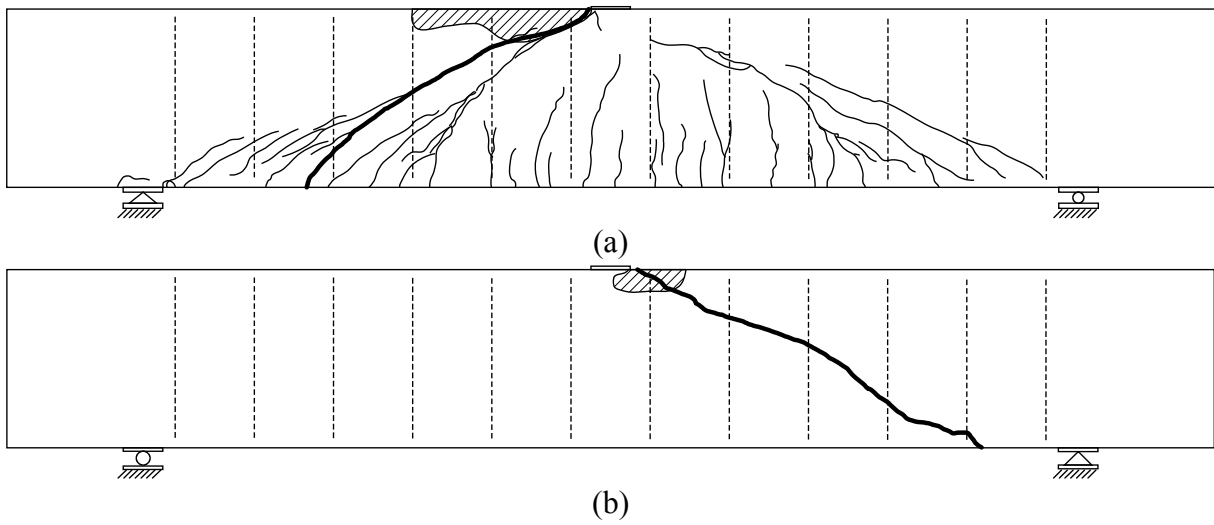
Observed damage in specimen P1S13, (a) front side, (b) back side
